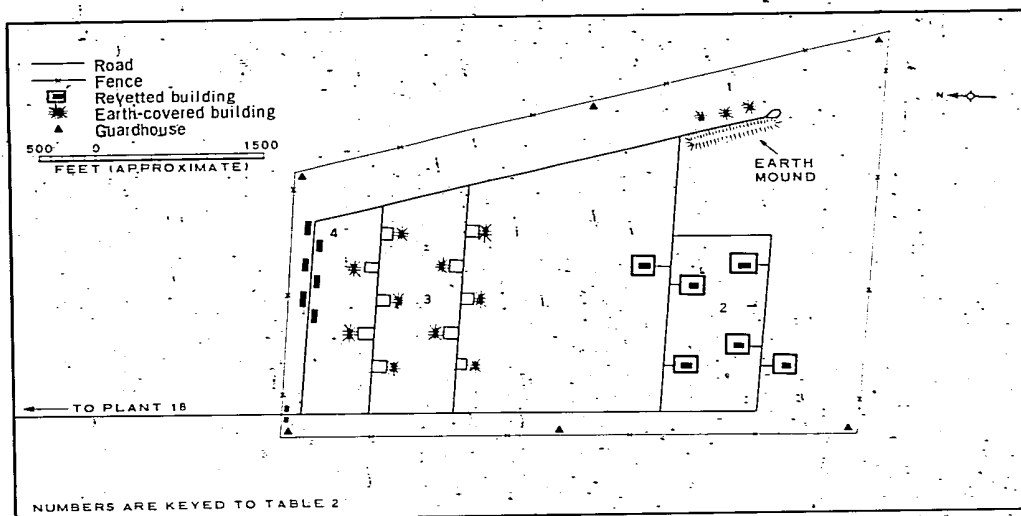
LAYOUT OF STORAGE FACILITY.
